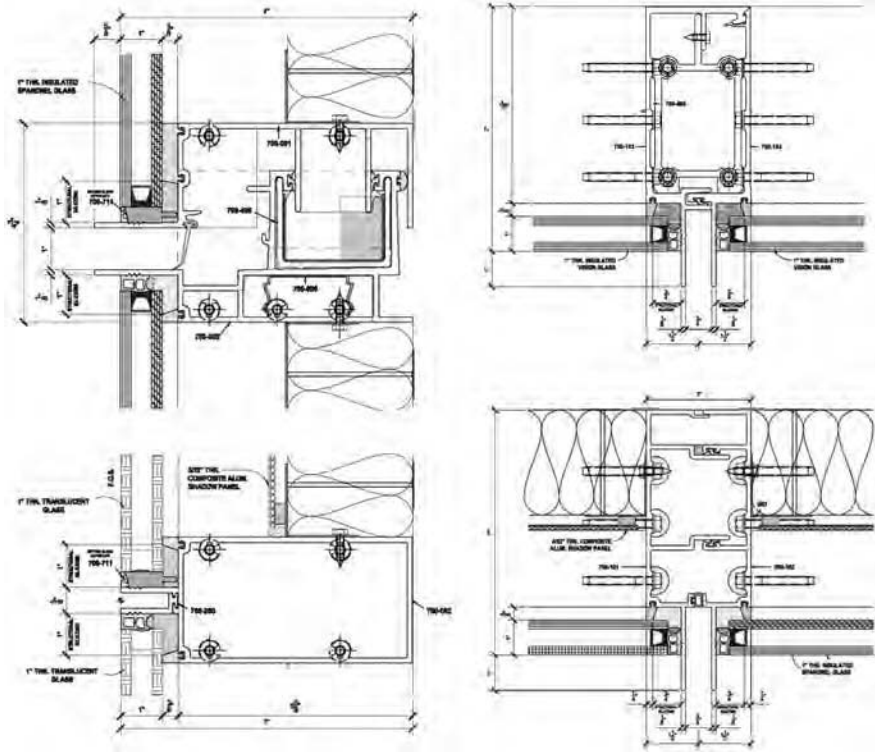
Typical details of horizontal and vertical stack joints to be used on the building (SI unit conversion: 1 in. = 25.4 mm).
